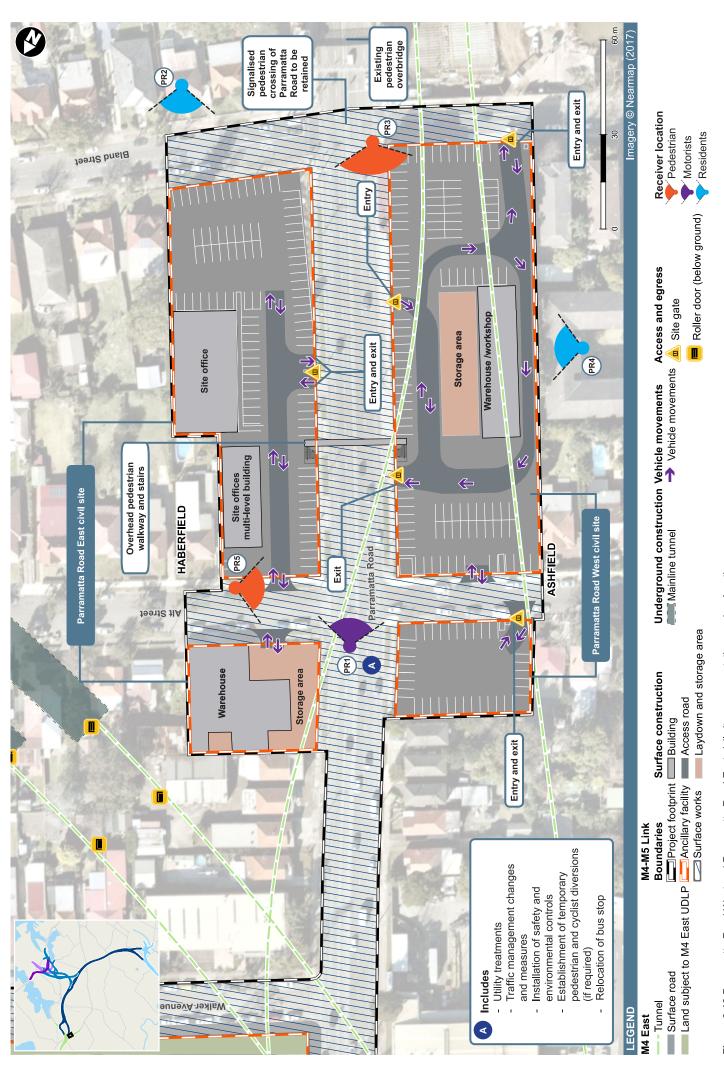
Parramatta Road West and Parramatta Road East civil sites representative receiver locations
